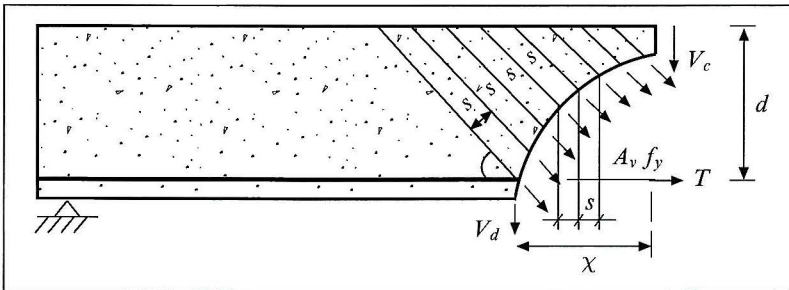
diagonal crack with inclined stirrups.
